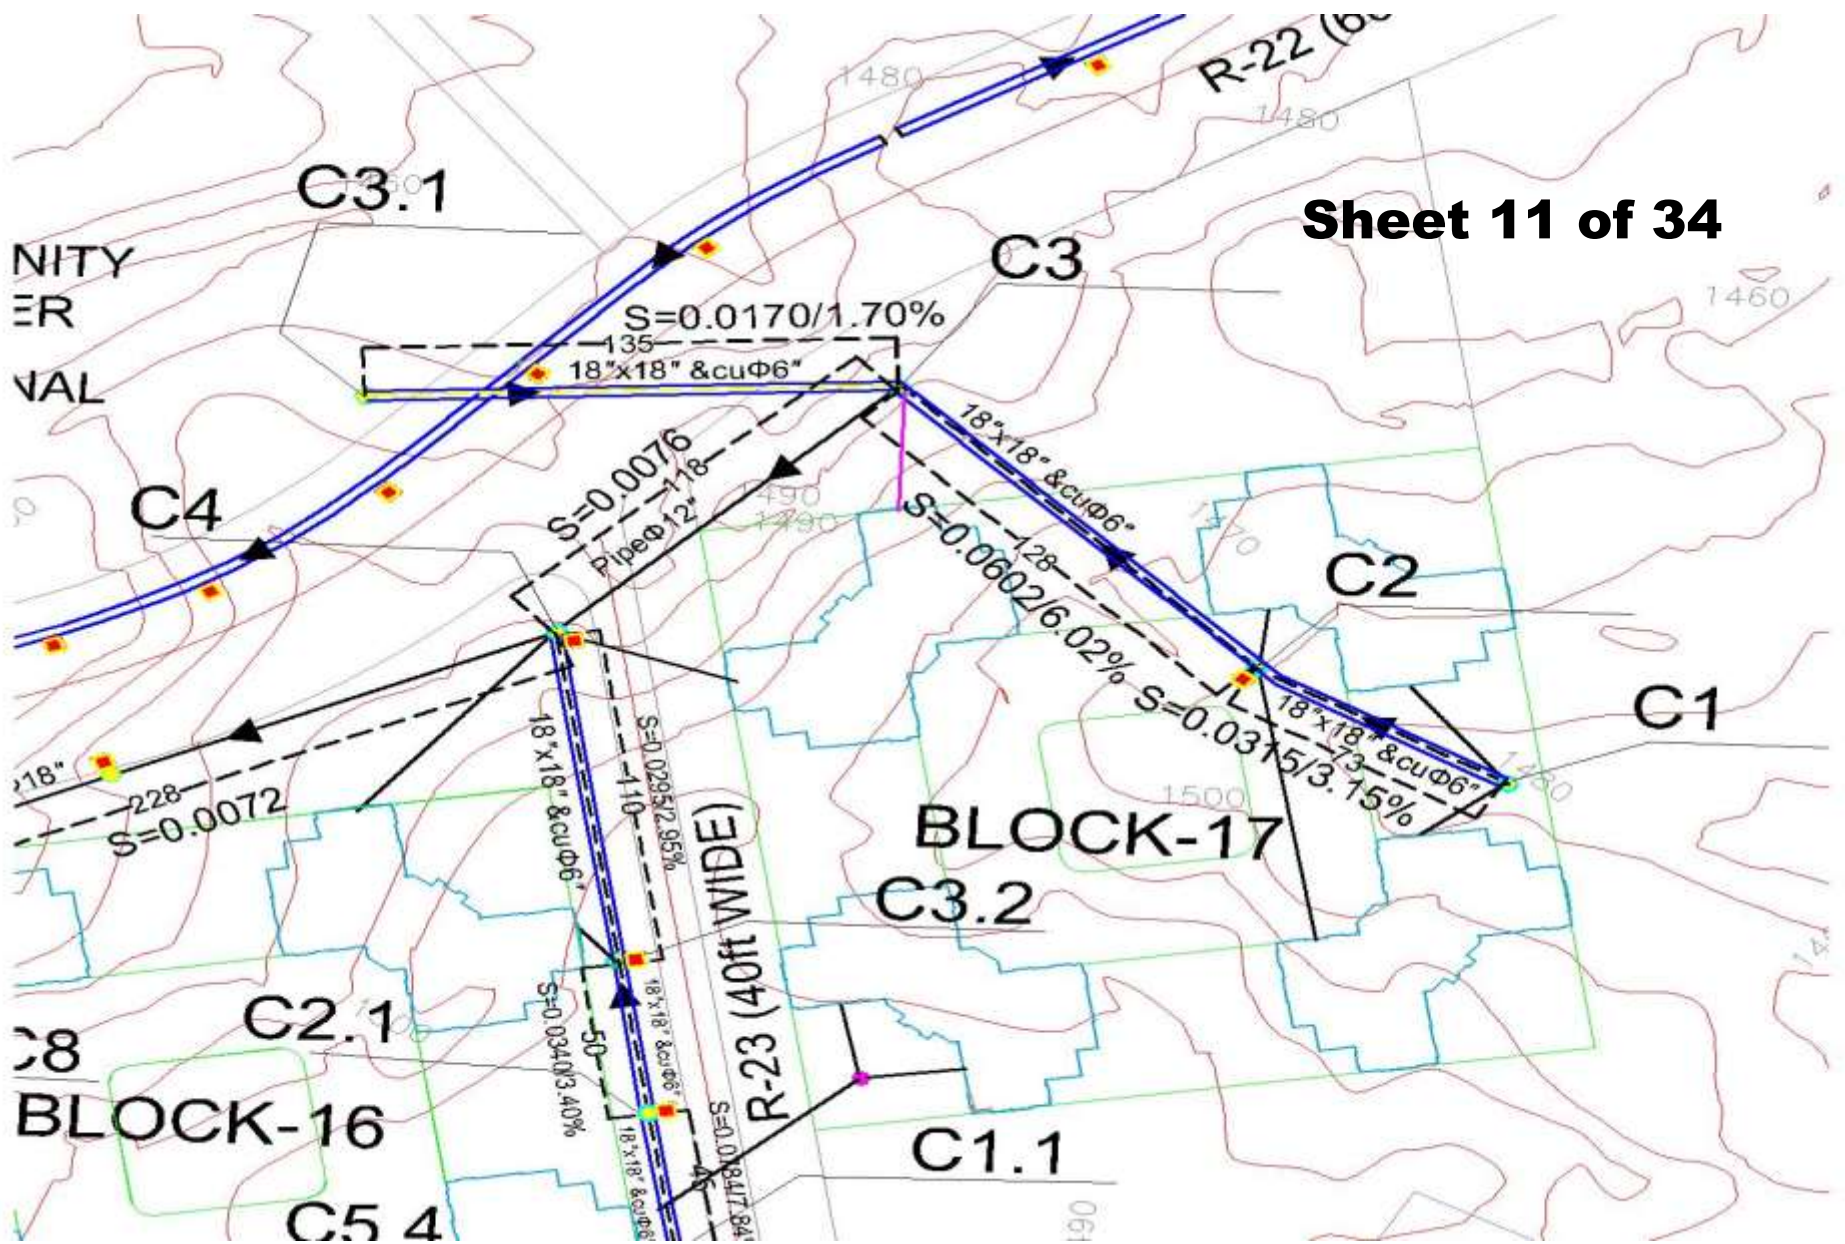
Combined drainage layout plan of Zone-3 showing intial node C1, C3.1 & separated storm drain along R-22
